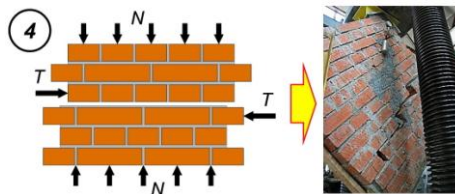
Clay brick masonry destruction pattern under shear loads in-plane parallel to horizontal joint
